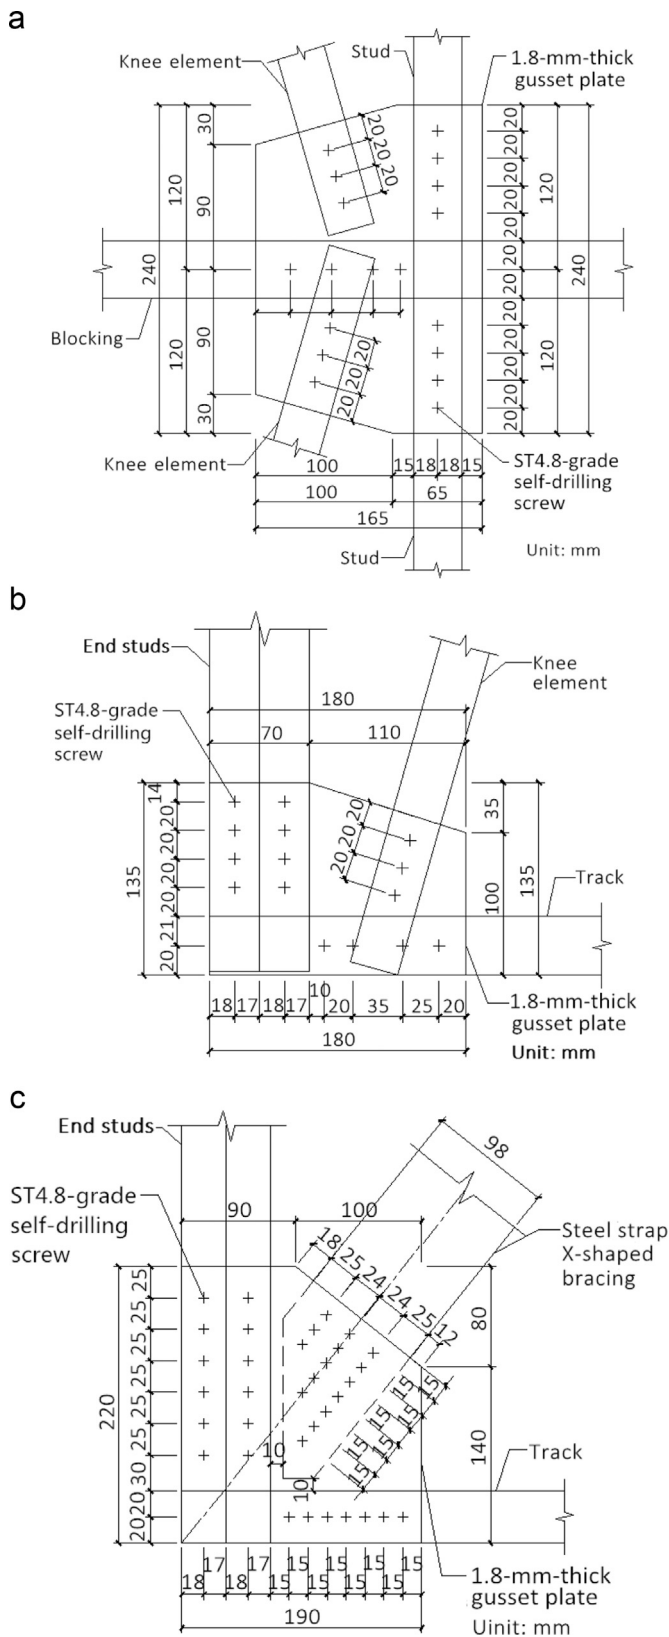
Details of connections: (a) connection of knee elements to studs and blockings, (b) connection of knee elements to tracks and end studs, and (c) connection of X-shaped bracings to tracks and end studs.
